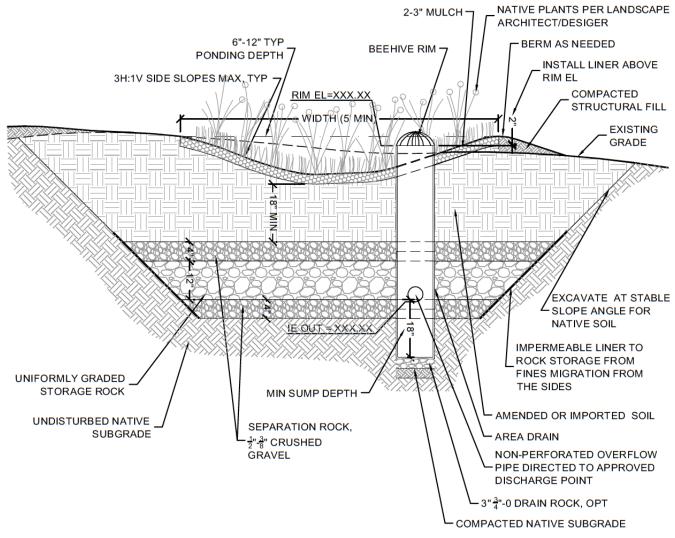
An example of an "Infiltration Rain Garden with Rock Trench". Not pictured, but also applicable to the above criteria are versions of a stormwater planter or LID swale (see Appendix F Standard Details).
